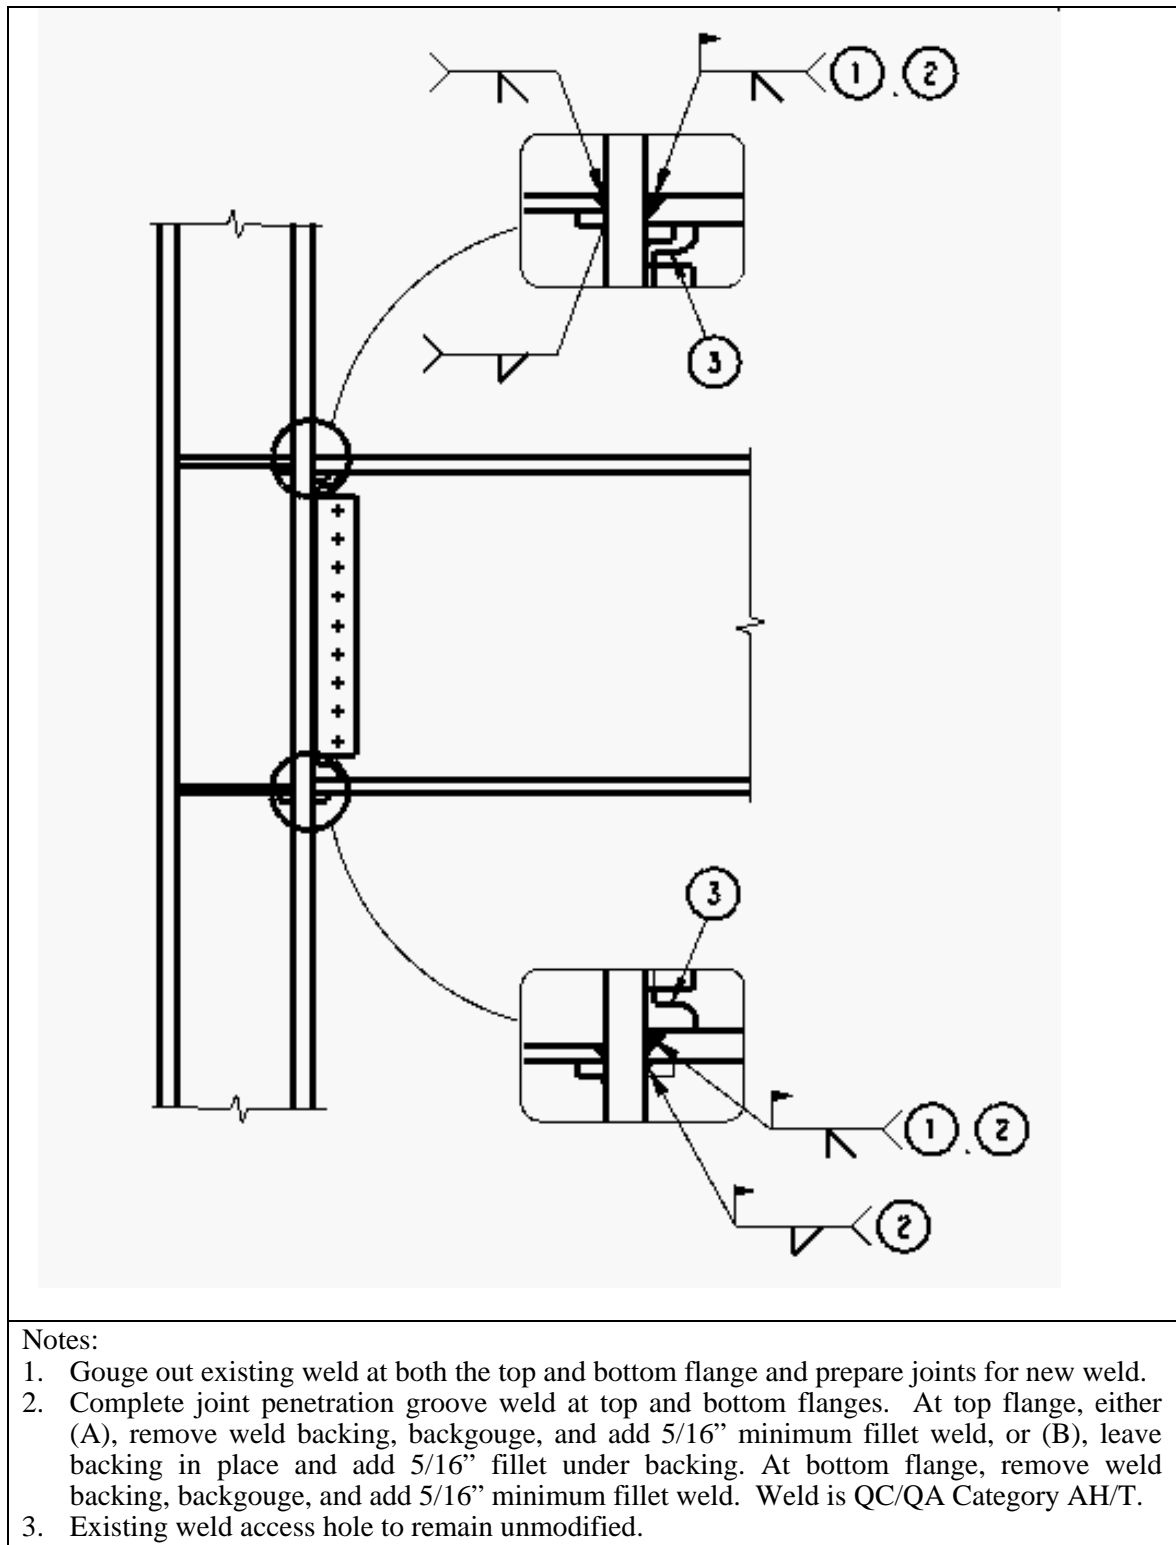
Welding Requirements at Improved Welded Unreinforced Flange Connection
